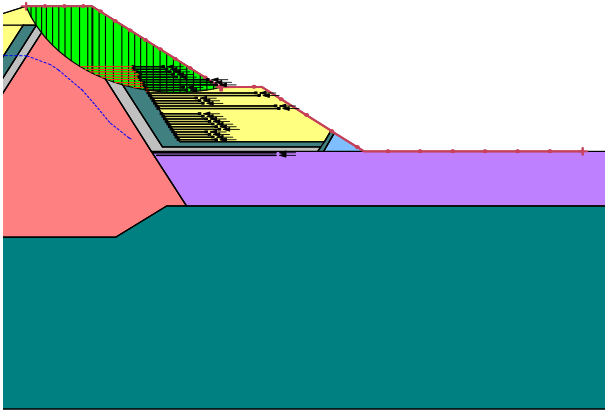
Detail F, shows the intersection between critical failure surface and reinforcement (1.25H: 1V)
